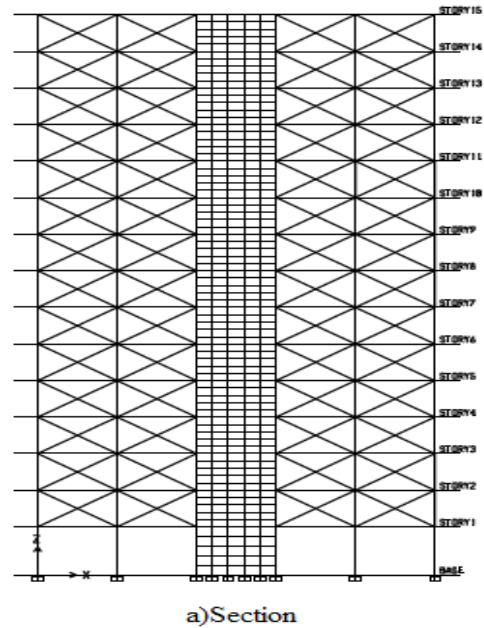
Model-8 OGS Frame with Shear wall at Sides (Central peripheral span provided with shear wall)
